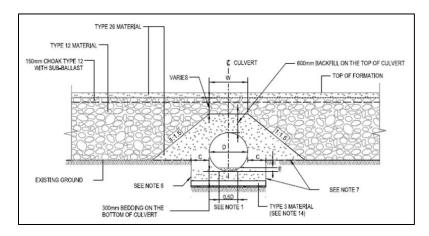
Single Pipe Culvert with Minimum Backfill Requirements
